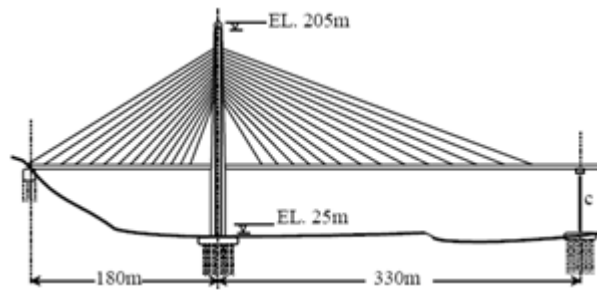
Layout of Kao-Ping-Hsi Bridge (unit: m)
